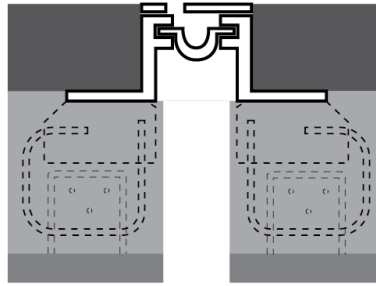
A simplified representation of an expansion joint, consisting of a steel construction filled with steel fibre reinforced concrete and a rubber padding (Doorn, 2016).
